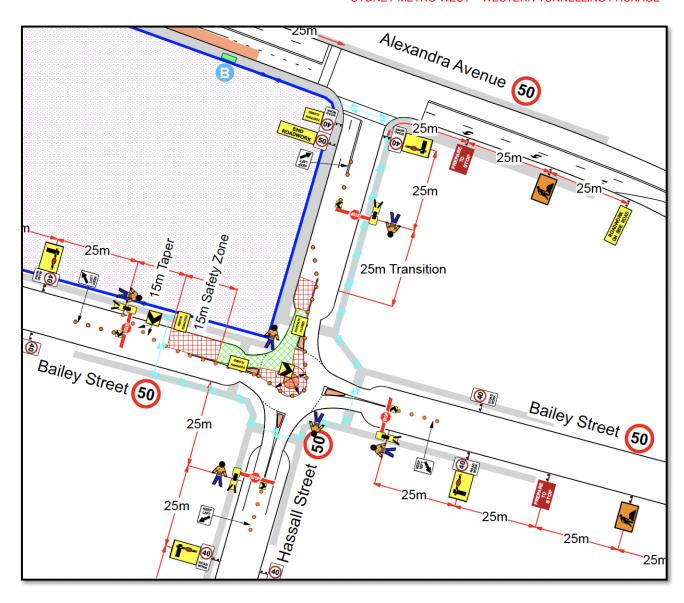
TGS Hassall St and Bailey St north western corner stop slow (refer to Appendix B for full TGS)
